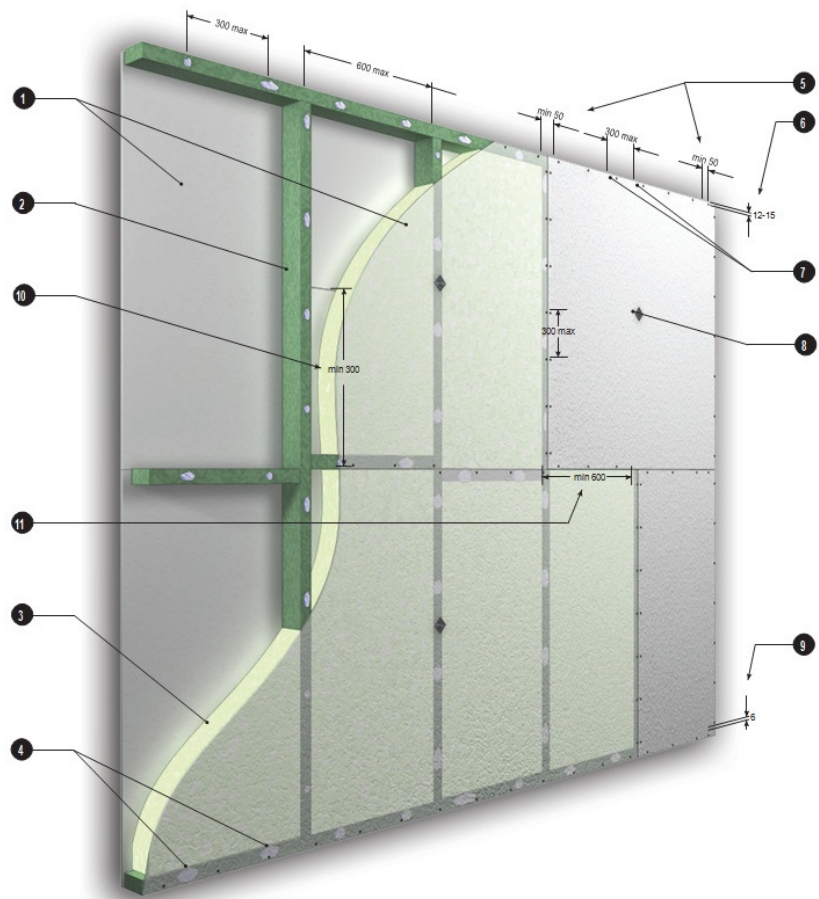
Timber Fire Wall Installation Detail (Horizontal)
